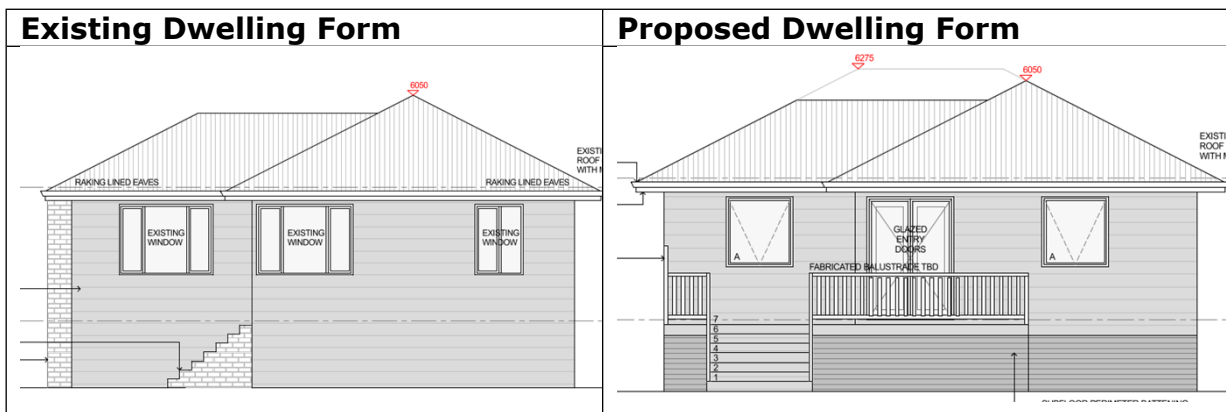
Front view of existing dwelling (view from eastern elevation)
